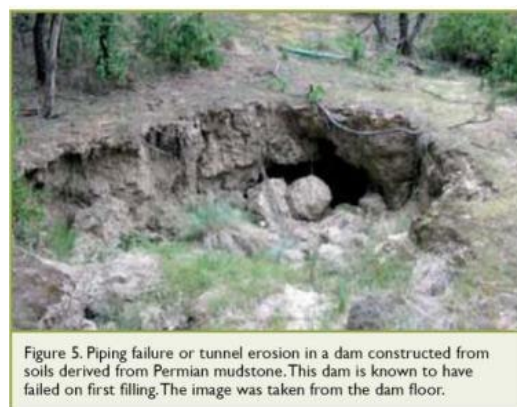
Piping failure or tunnel erosion in a dam constructed from soils derived from Permian mudstone. This dam is known to have failed on first filling. The image was taken from the dam floor.
